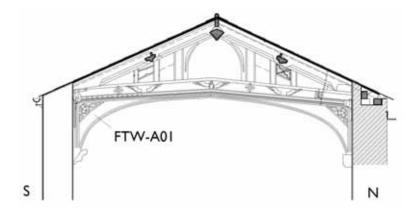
East elevation of principal truss I (based on truss II), showing the location of sample FTW-A0I (Freeland Rees Roberts Architects)
